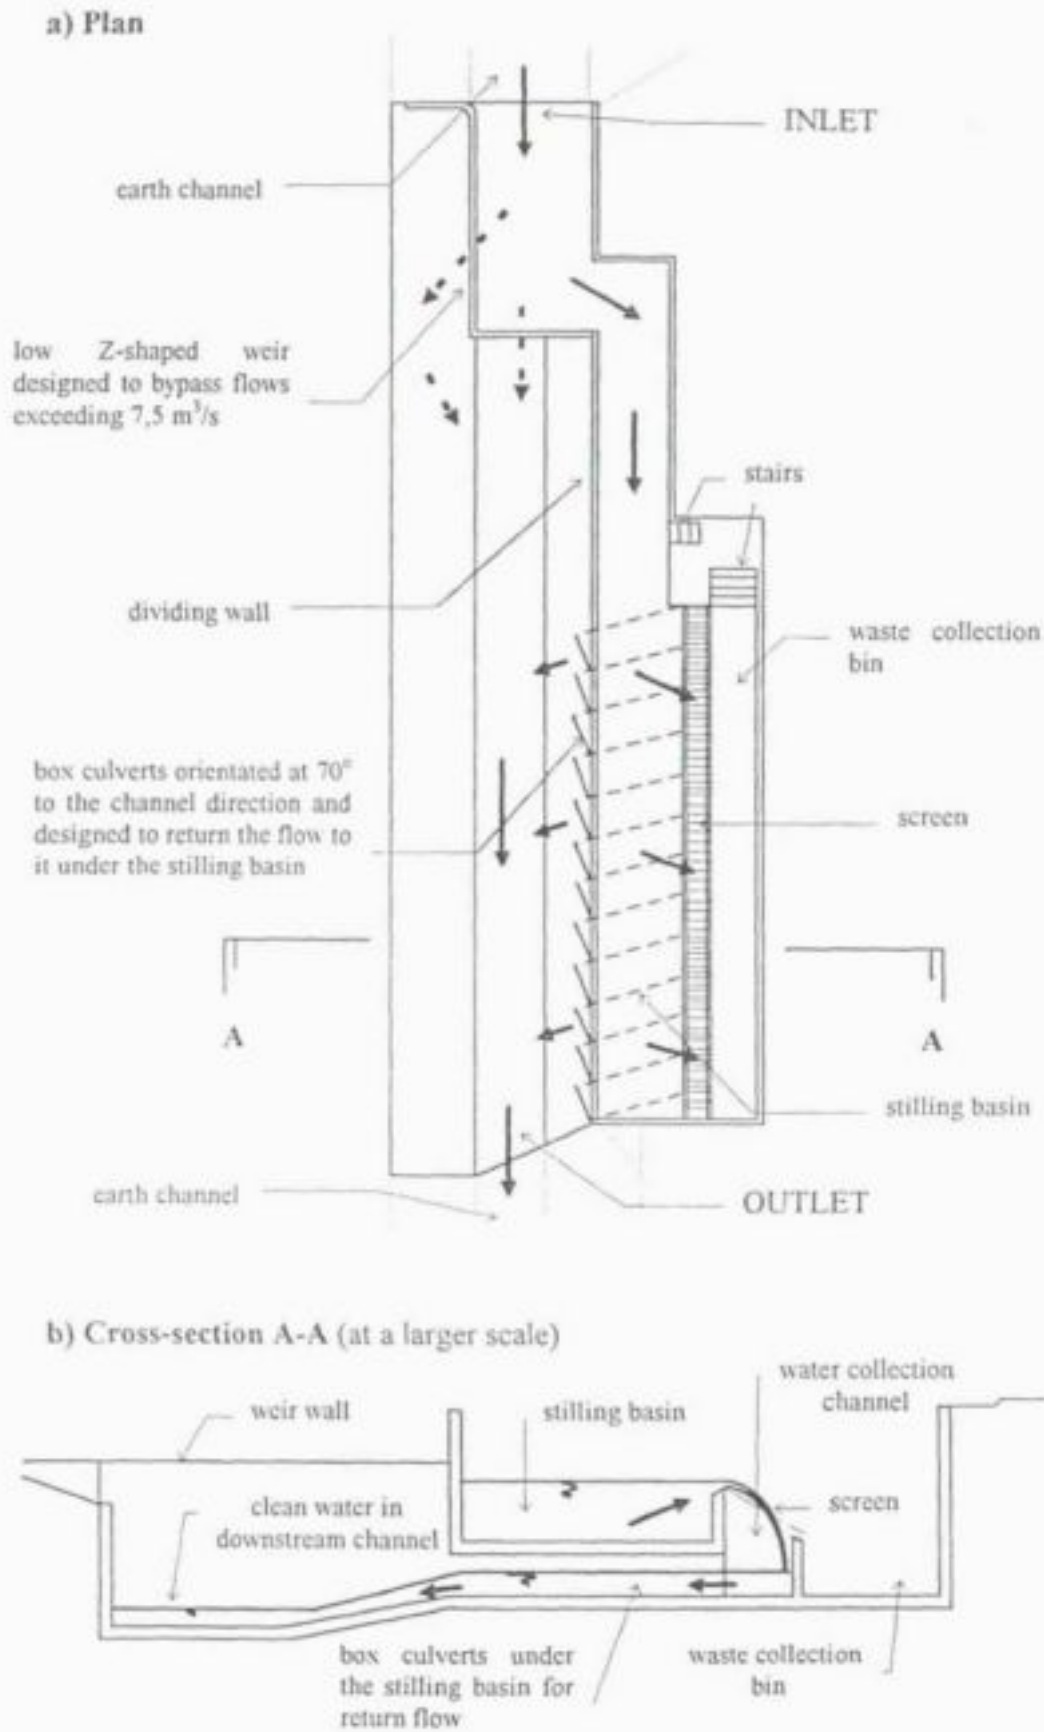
Plan and cross-section of the SCS structure constructed in Springs
